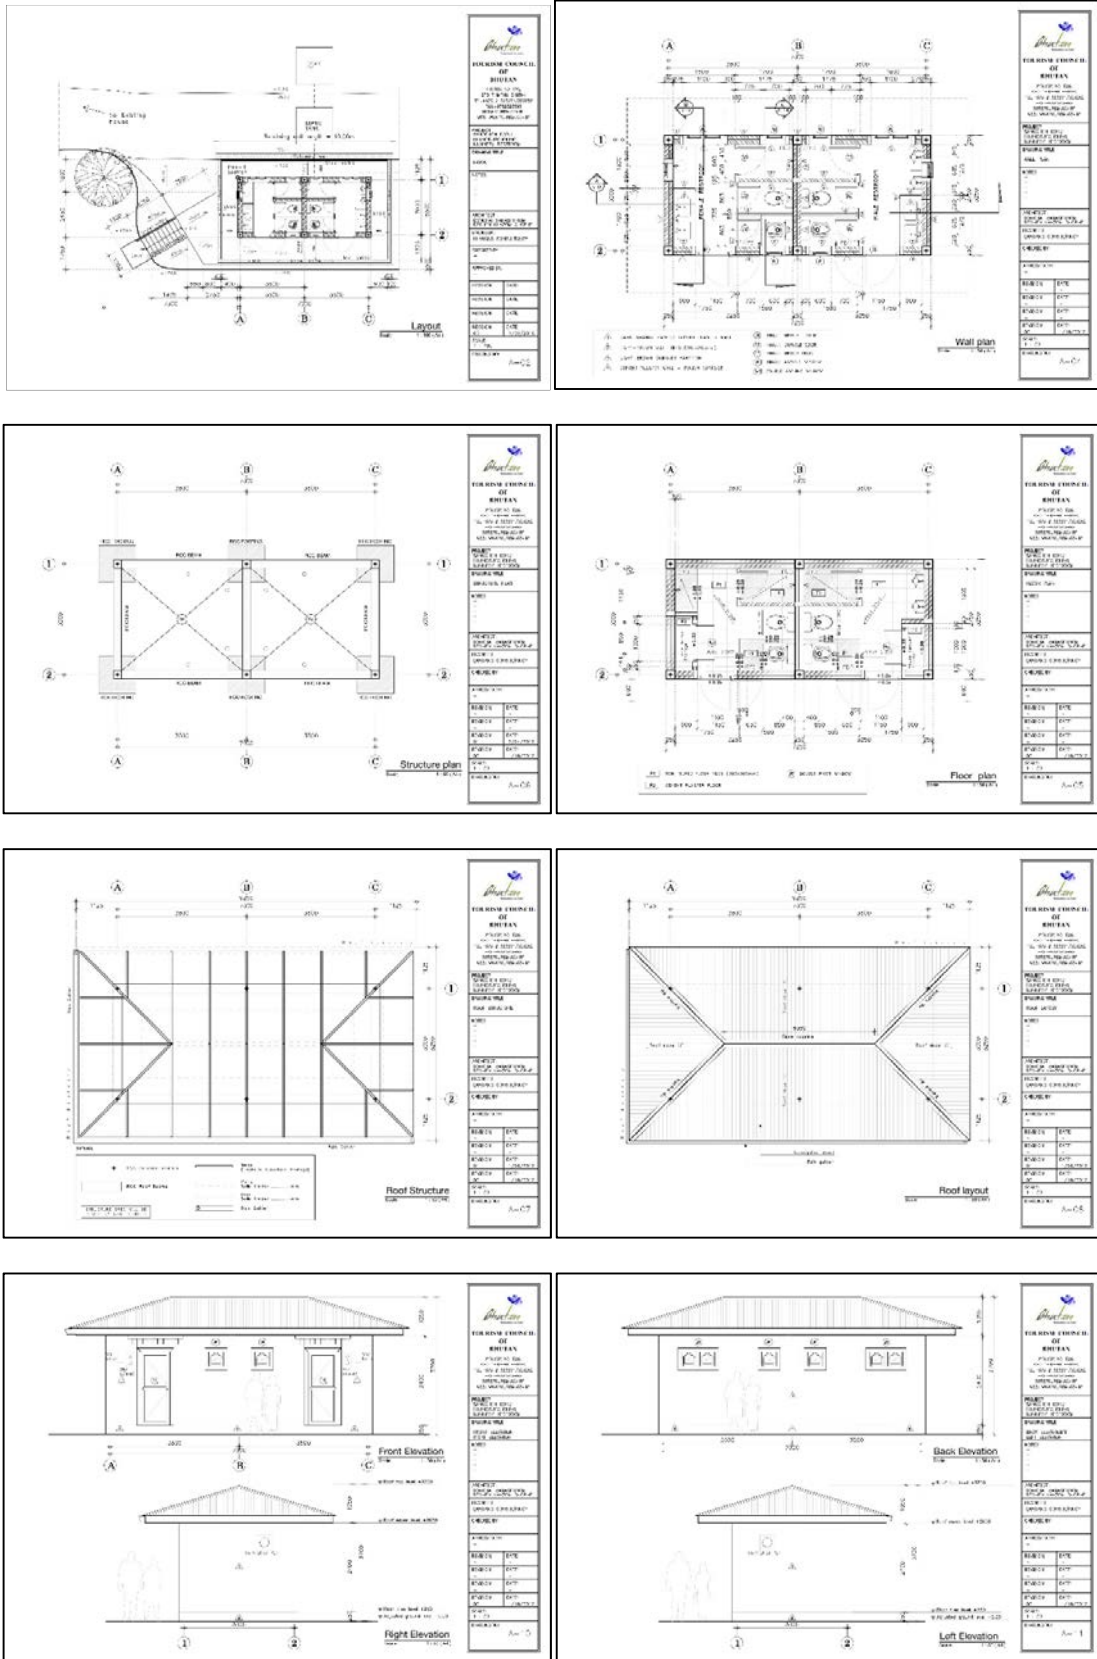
Construction drawings of Sangchen Dorji Lhundrup nunnery restrooms
